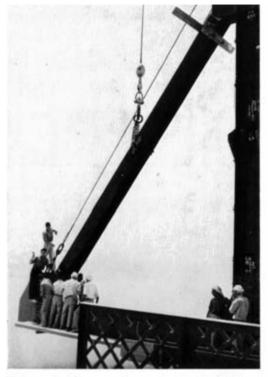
Applying external prestressing forces by S.W.R. and turnbuckles to close one triangle of an Anchor Span.
